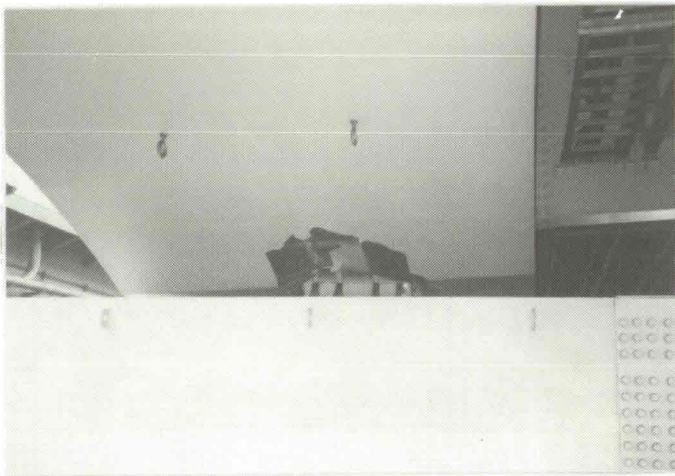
Road girder displaced from bearing, and bearing girder thrust into box girder (Kobe Route, near Koshien)
